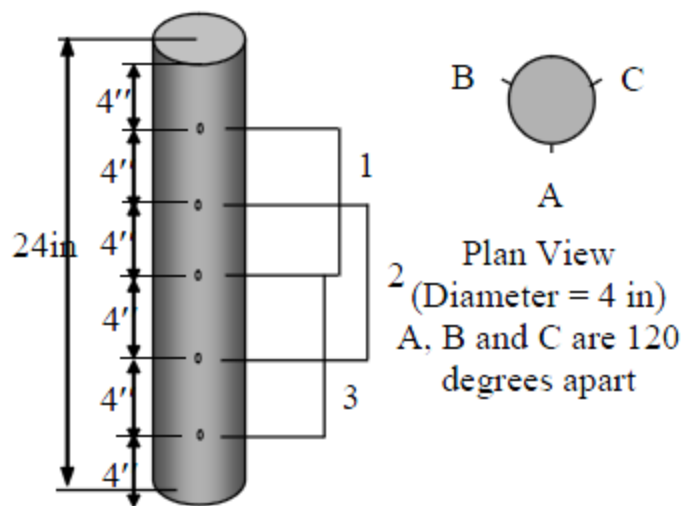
Shrinkage and Creep Specimens and DEMEC Point Arrangement (Myers and Yang, 2005)
